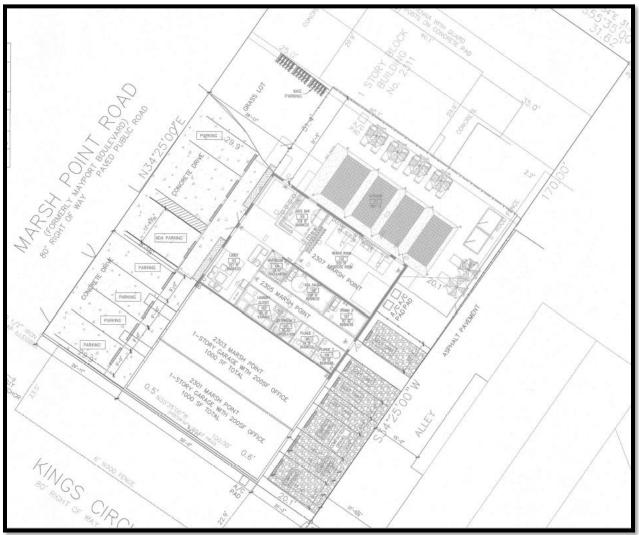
Proposed Immerse Site Plan, 2301, 2303, 2305, and 2307 Marsh Point Rd, Neptune Beach, FL
